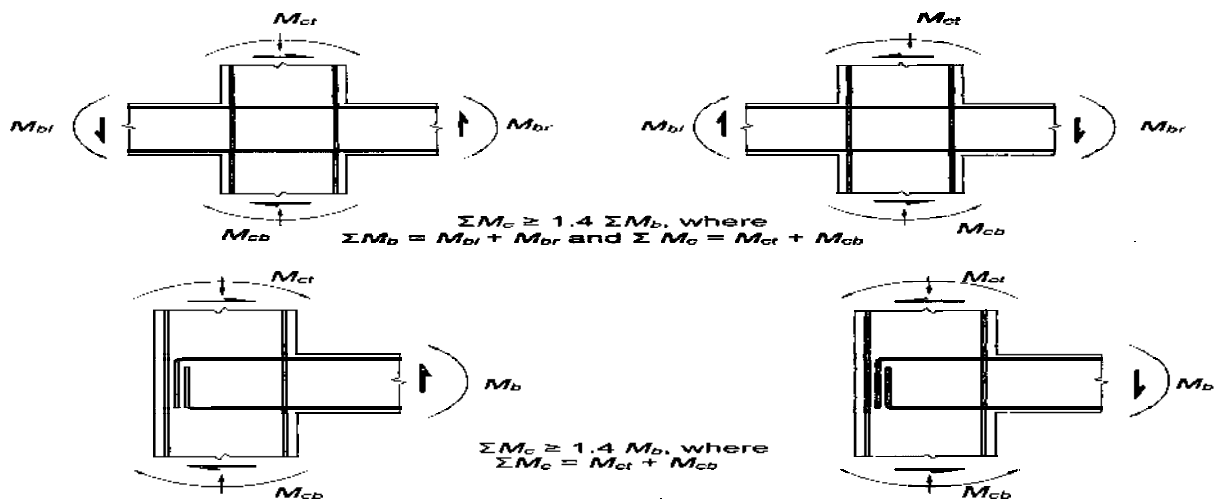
STRONG COLUMN – WEAK BEAM REQUIREMENT
